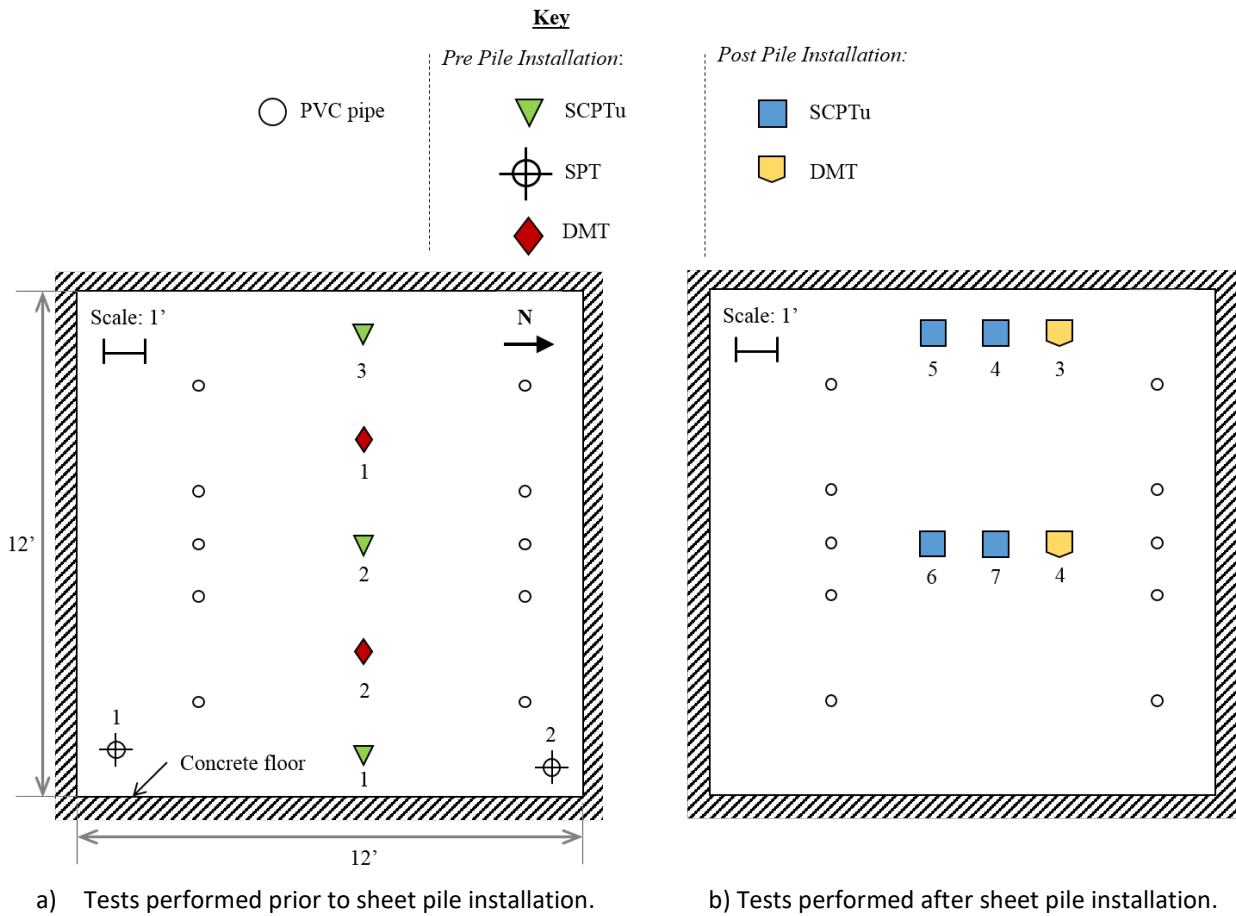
Plan view showing locations of in-situ testing in test pit.
